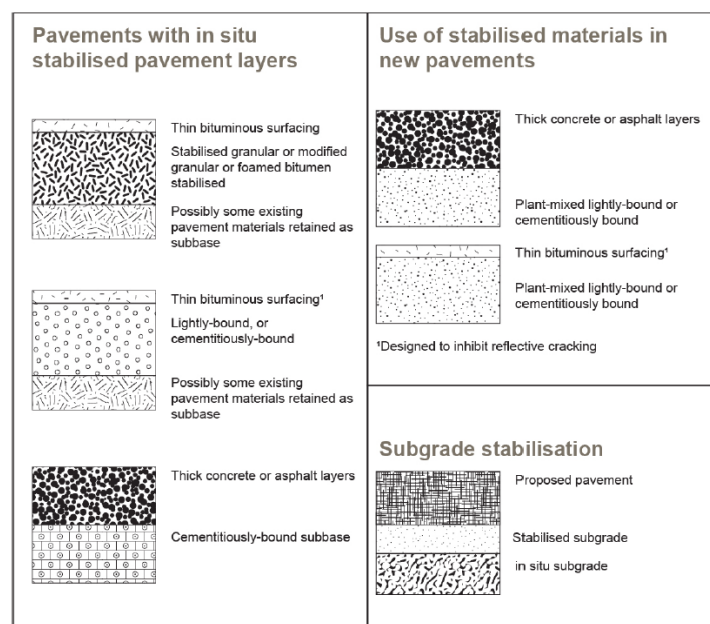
Typical Flexible Pavement Structure (Austroads, 2017)
